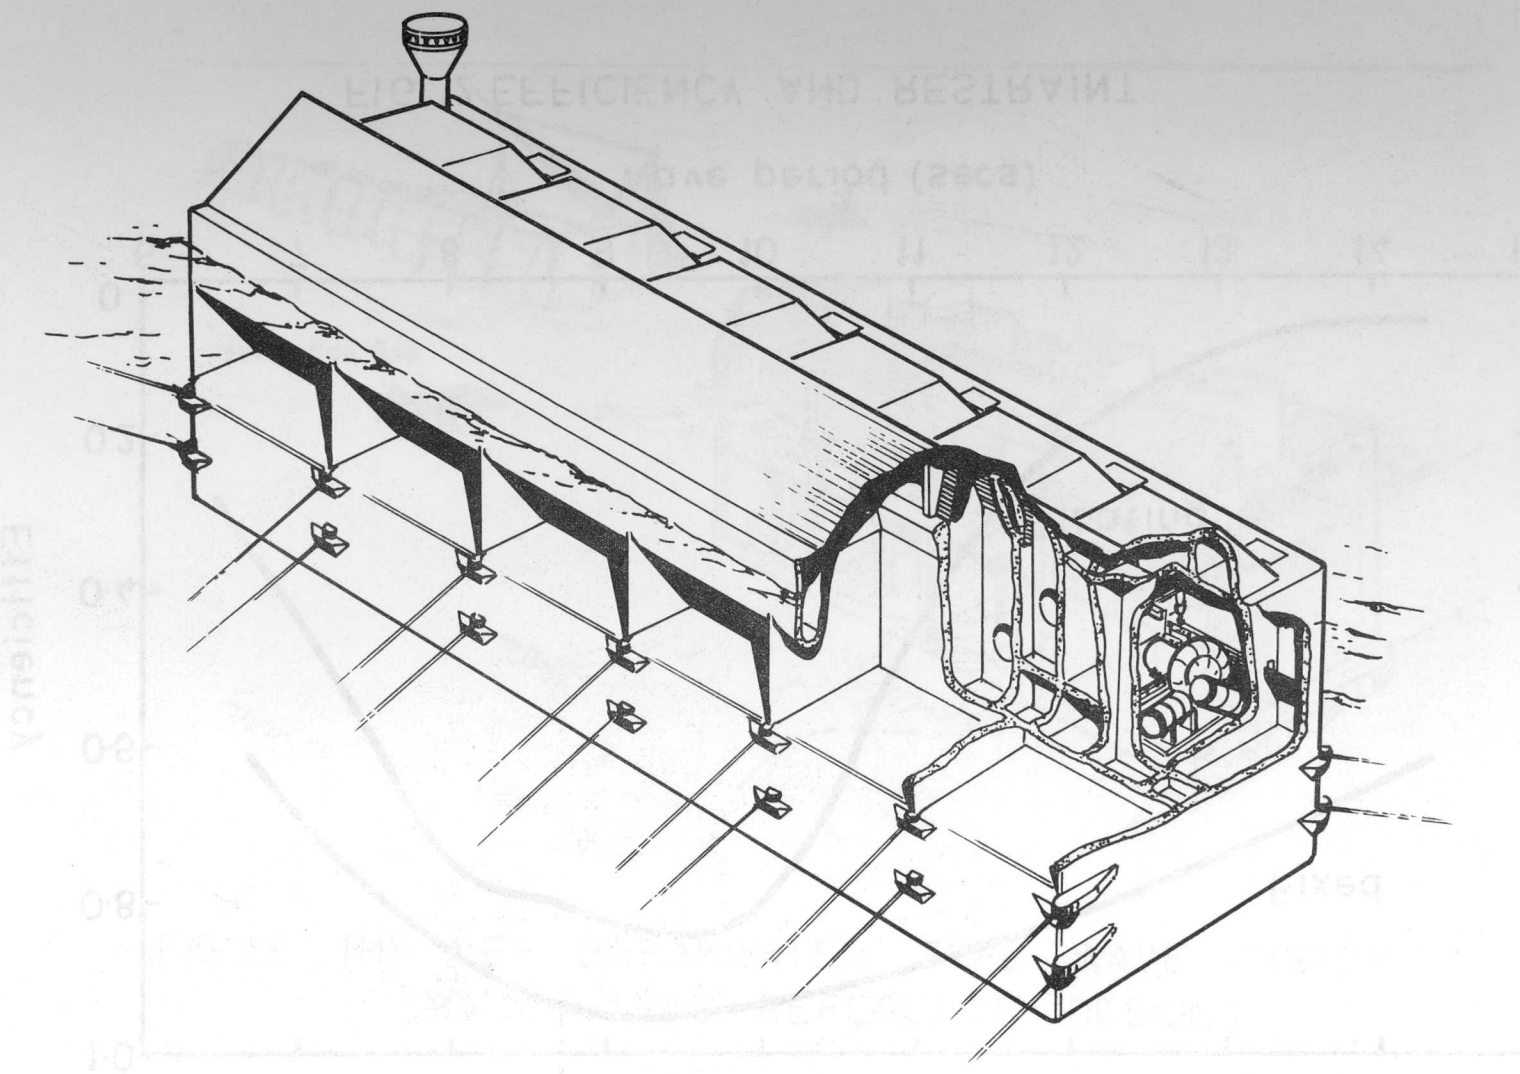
FLOATING STRUCTURE - CONCRETE DESIGN (1978)
